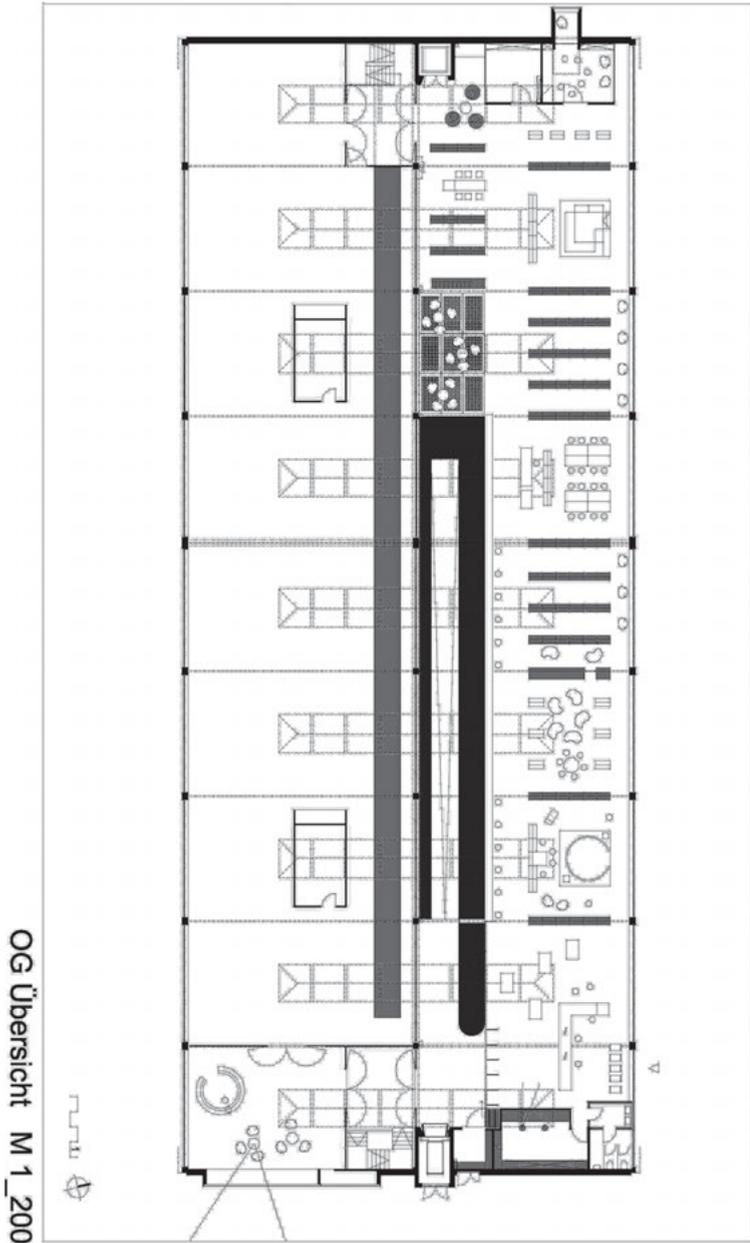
The plan of the finished project. © baldauf architekten gmbh (Frank 2011).
